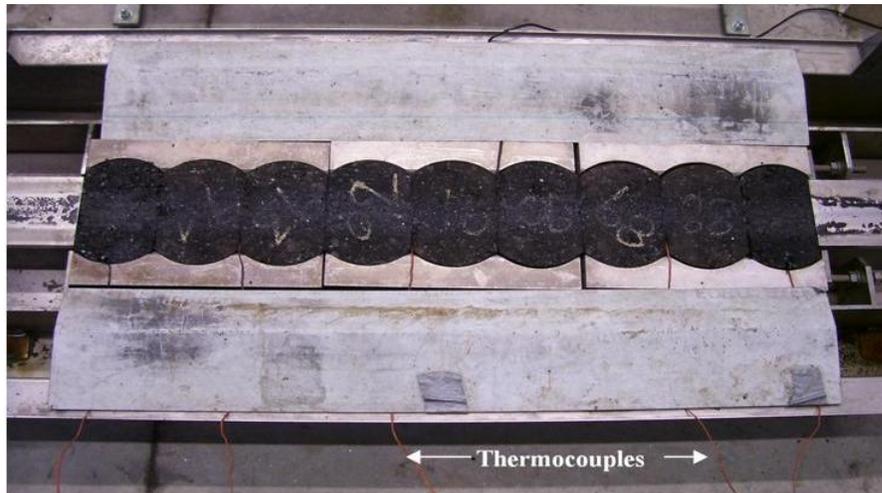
Specimens Clamped into MMLS3 Test Bed
